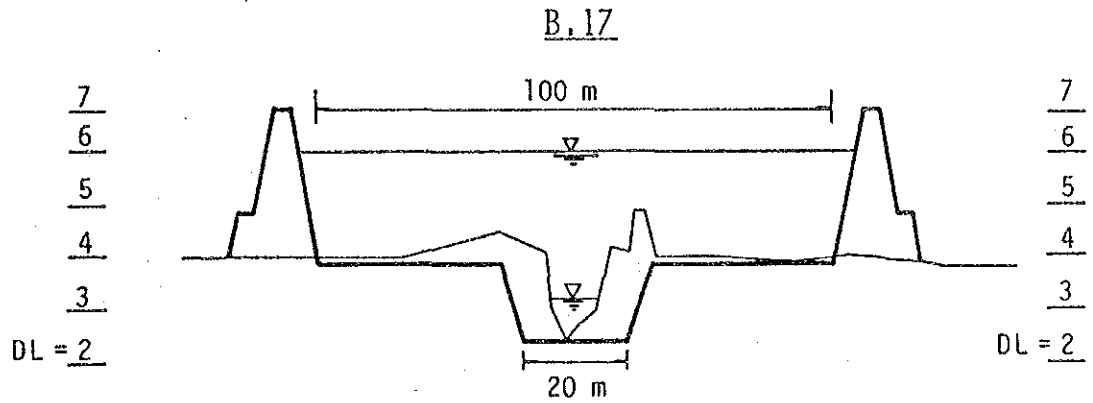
Proposed Long-Term Plan of Asahan and Silau Rivers (1/6)
